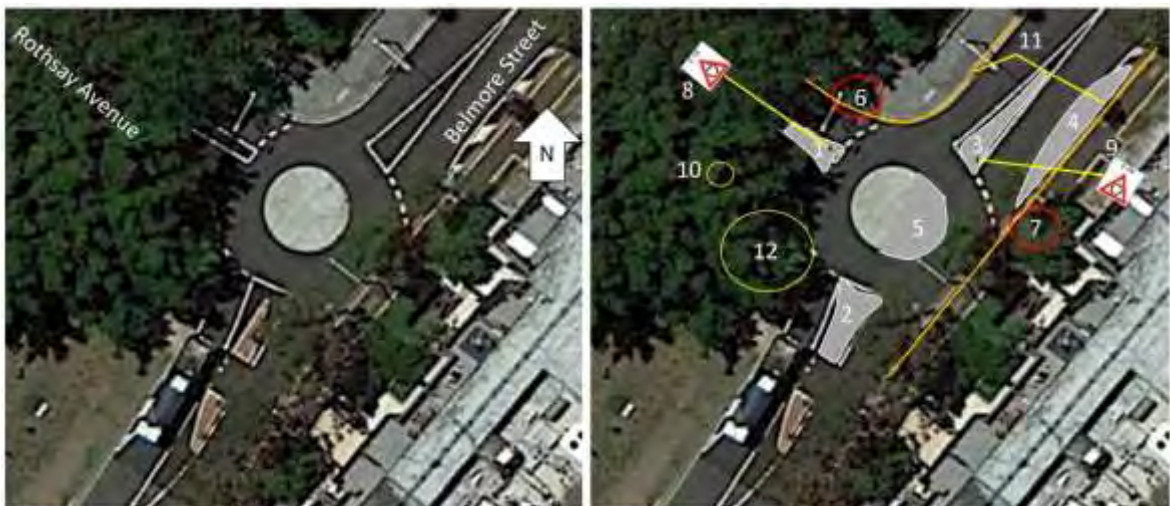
An aerial view of the existing intersection and proposed improvement concept
